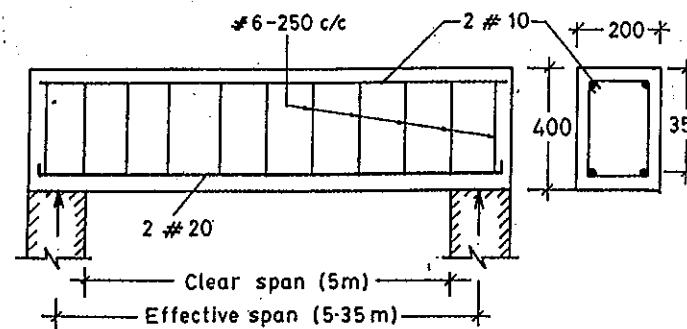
Reinforcement Details in Singly Reinforced Rectangular Beam
